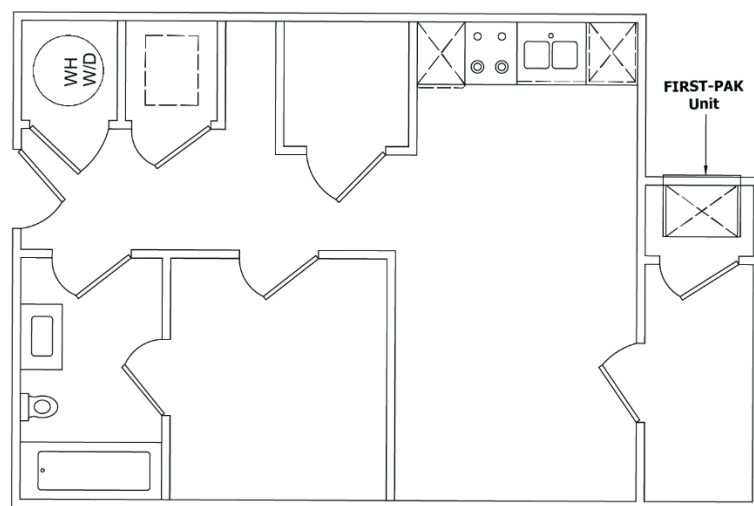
Typical Floorplan with FIRST-PAK on Exterior Wall
